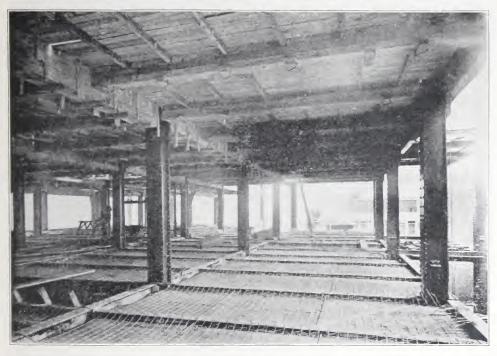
Stern Brothers Building, 23rd Street, New York City. Architects, Maynicke & Franke; Contractors, Thompson-Starrett Co. 230,500 square feet Triangle Mesh used in the floors of this building.
